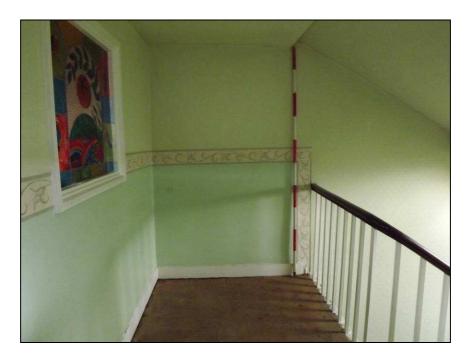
View looking north showing the location of the second floor within the roof space (Scale = 2m)
